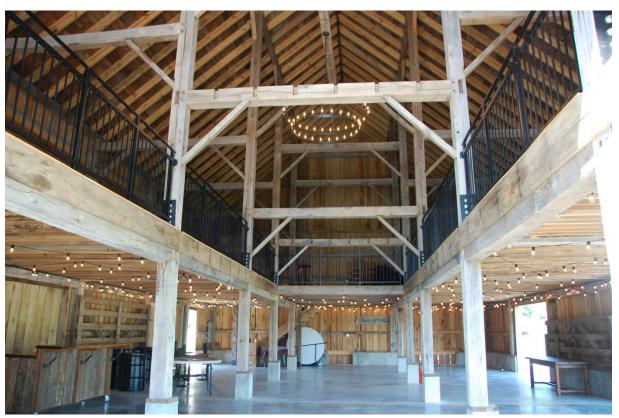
Interior of transverse frame barn from east end, looking toward west wall (Photo #28: Danielle Bachant-Bell, April 4, 2018).
